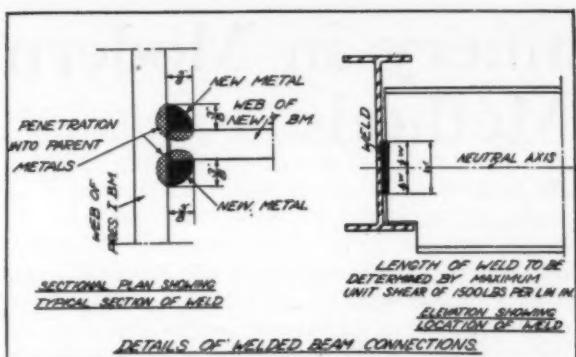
Welding Details in Framing in the New Elevator Well
